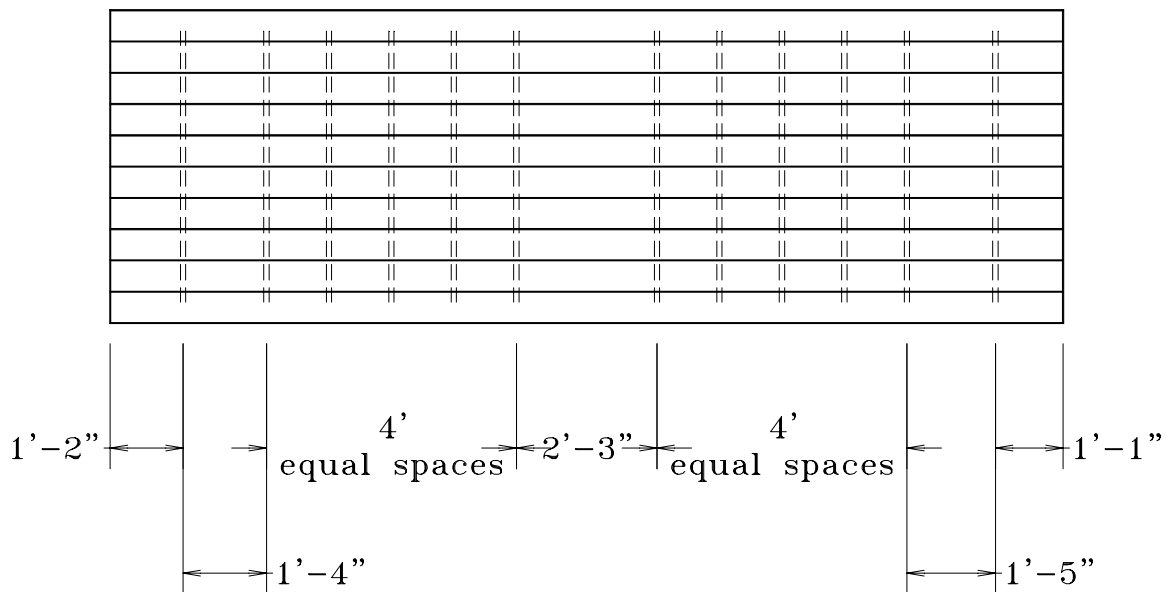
Plan view of FRP deck panel (thru-rods not shown)
